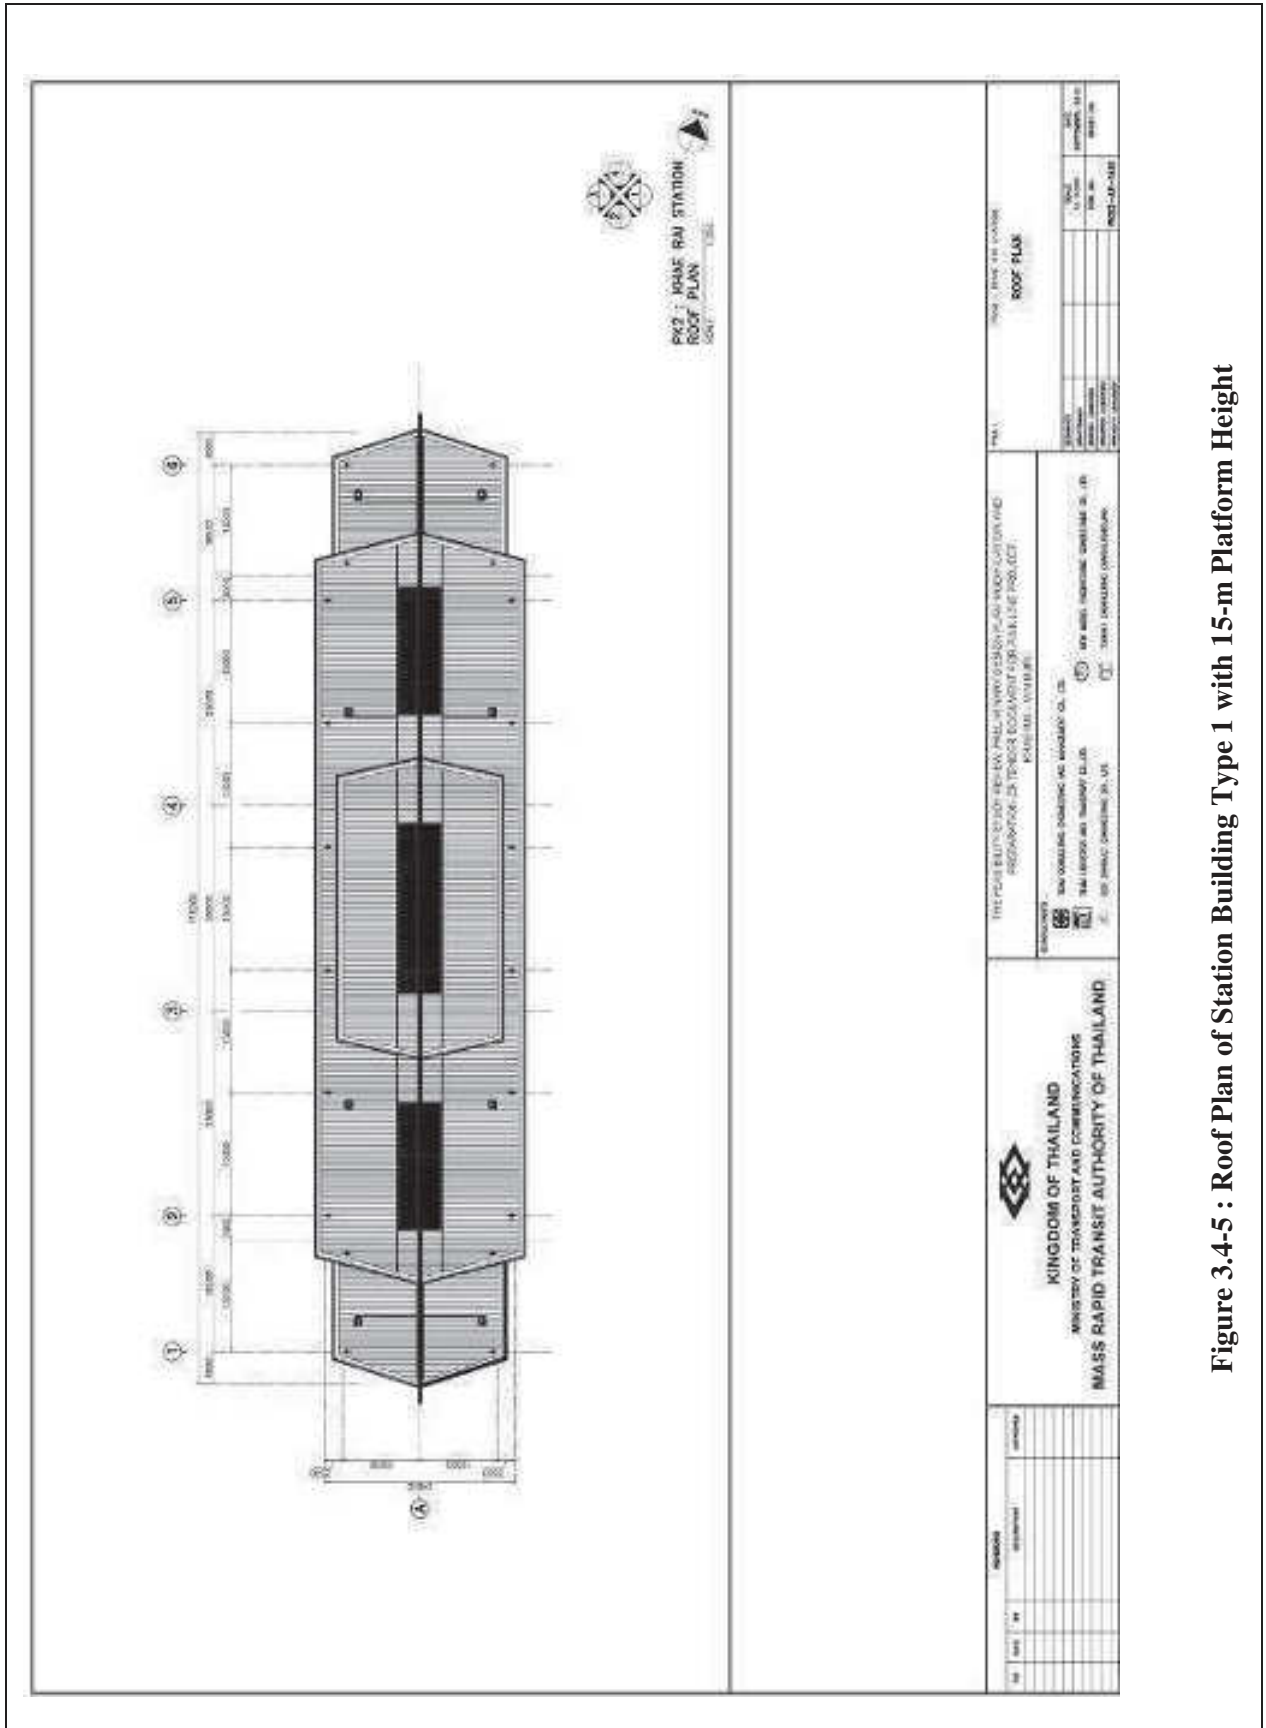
Roof Plan of Station Building Type 1 with 15-m Platform Height
